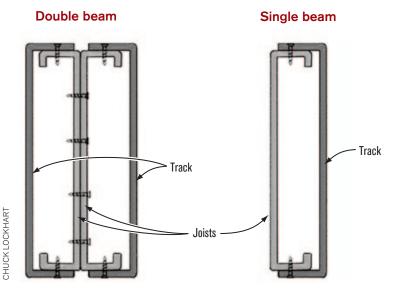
LGS beams are made by joining a joist and a track. A single beam (right) consists of one joist and one track, while a double beam (left) consists of two single-beam assemblies.
